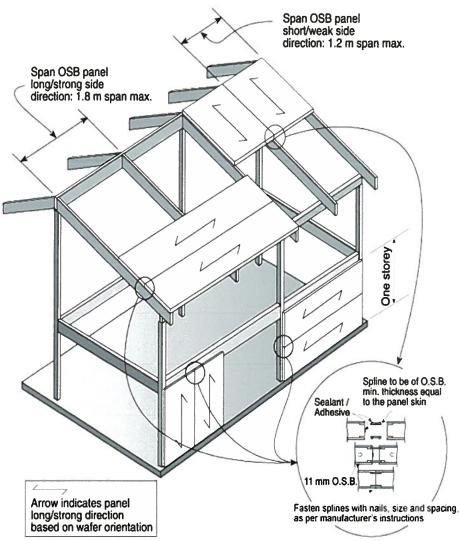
"Insulspan SIP System" – non-axially loaded structural panels with OSB splines on post-and-beam frame with limited roof spans of 1.2 m in OSB weak direction and 1.8 m in OSB strong direction. See manufacturer's panel-to-structure fastening details.
